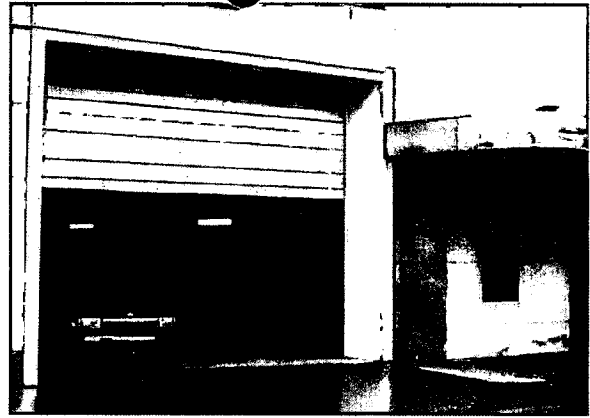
Existing area to be remodeled. New storefront would be installed where loading door currently exists. Existing window to remain can be seen at right of photo.
